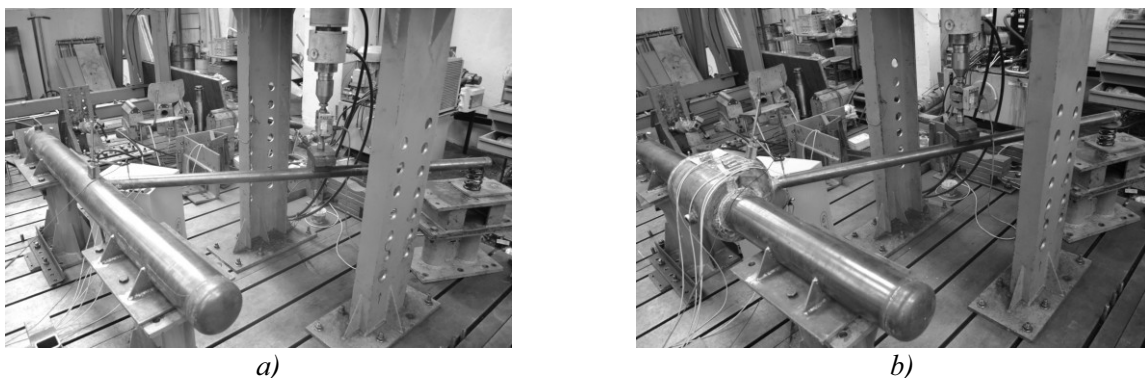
Experimental test arrangement for branch connection without reinforcement (a) and with split sleeve (b)
